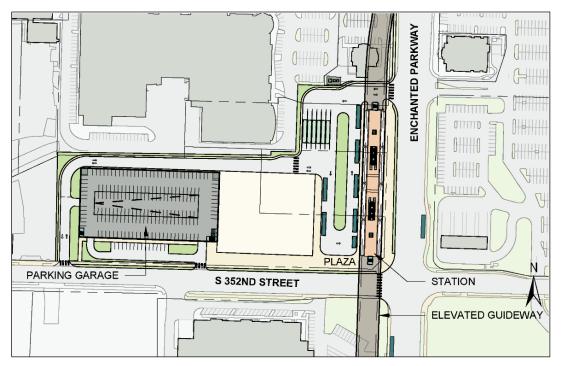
SF Enchanted Parkway Station with Parking Garage
